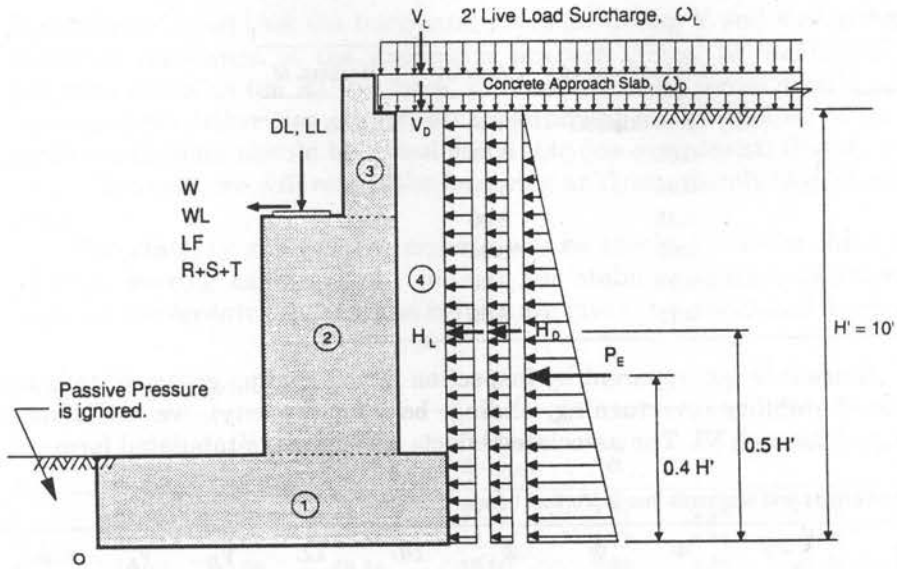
Abutment of Design Example 7-2; loads and forces.
